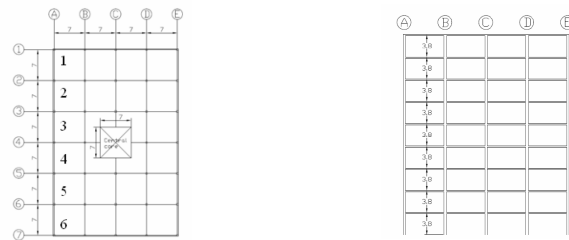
Plan and elevation of the generic concrete structure (distances in m)
